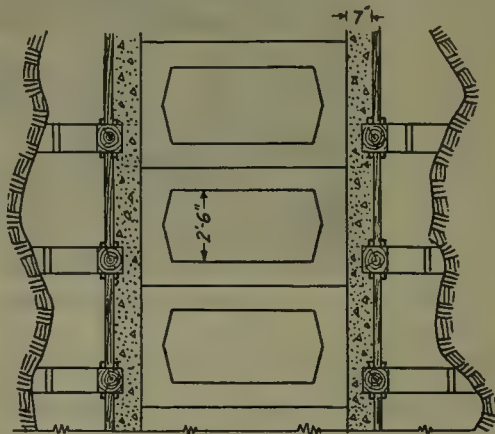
SKETCH SHOWING TYPE OF CONSTRUCTION USED IN THE RHYOLITE
